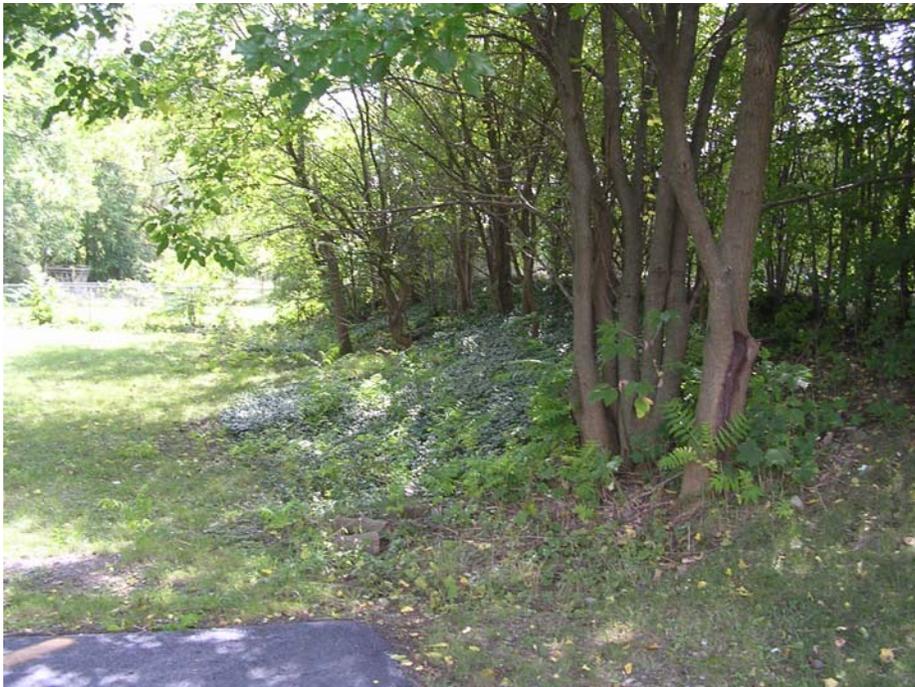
Trees and brush on levee – left bank upstream of Ballantyne Road bridge.
